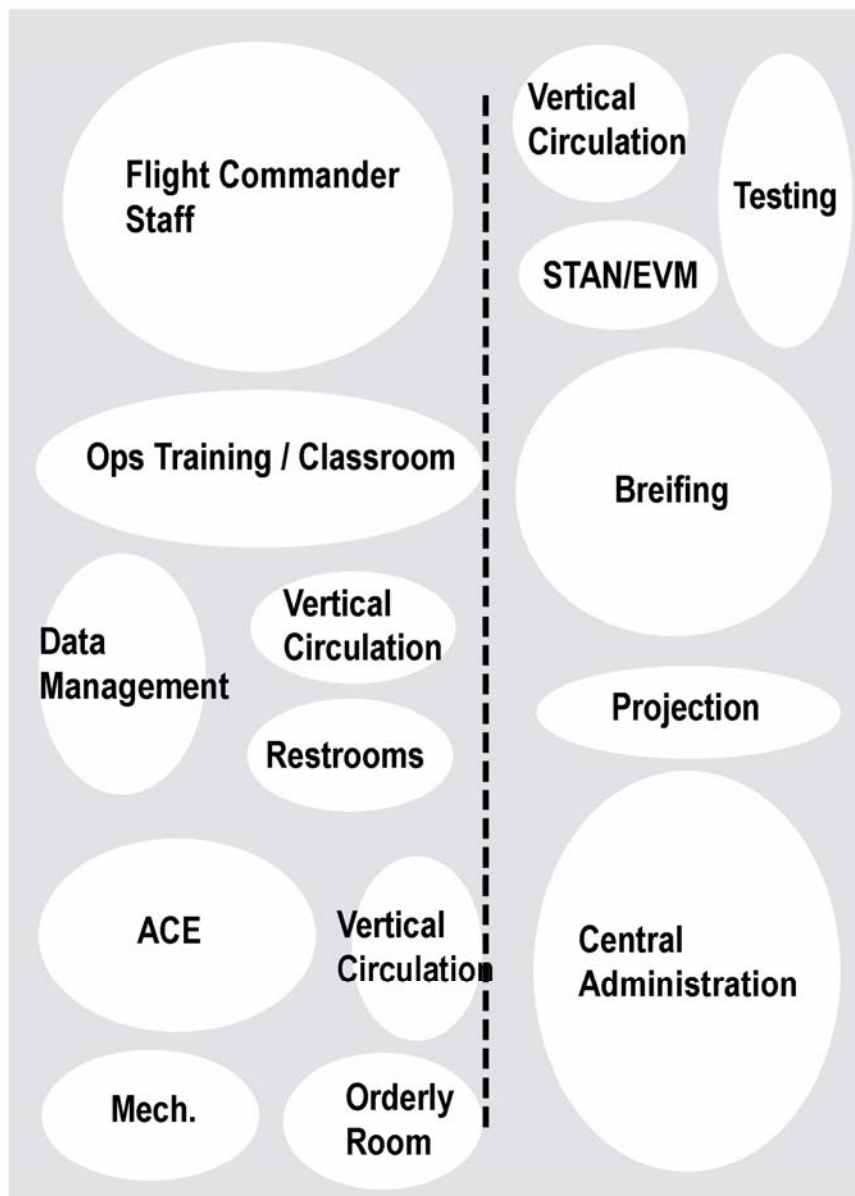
Concept Floor Plan C-5 and C-17 (Second Floor)
